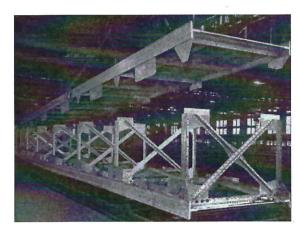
Lowering one of the girders into position to complete the shop assembly of the all-aluminum span. Photo from Railway Age. ¹²
